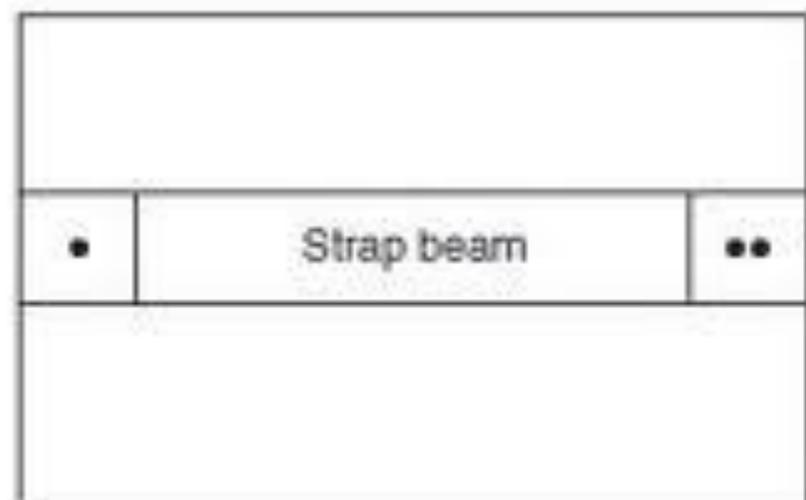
Combined footing [Strap beam may or may not be provided]
